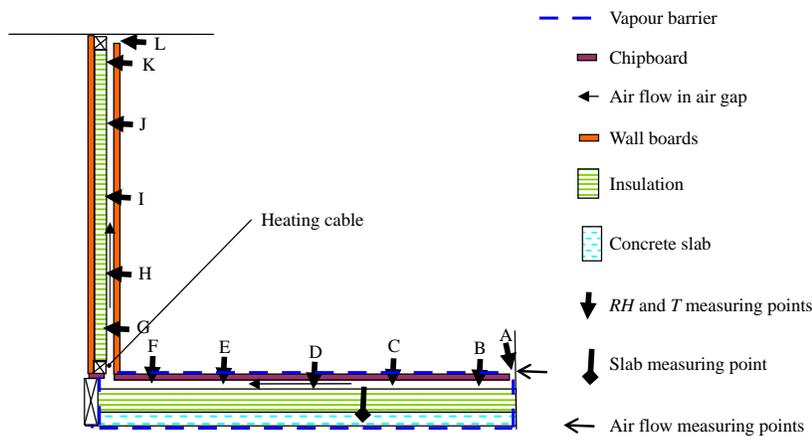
Schematic cross-section of wall and floor construction by the air gap system, supplied with measurement points for *RH* and *T* in air gaps and concrete slab
